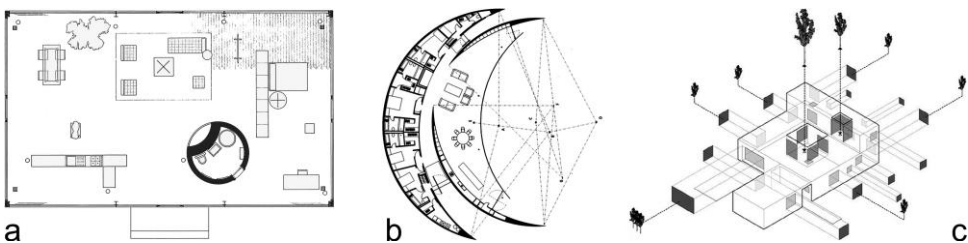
Motive of view towards the surrounding: a) Glass House, New Canaan, Philip Johnson, 1949; b) Crescent House, Winterbrook, Ken Shuttleworth, 2000; c) Princeton House, Princeton, Levenbetts, 2014 (Source: author's private collection)
